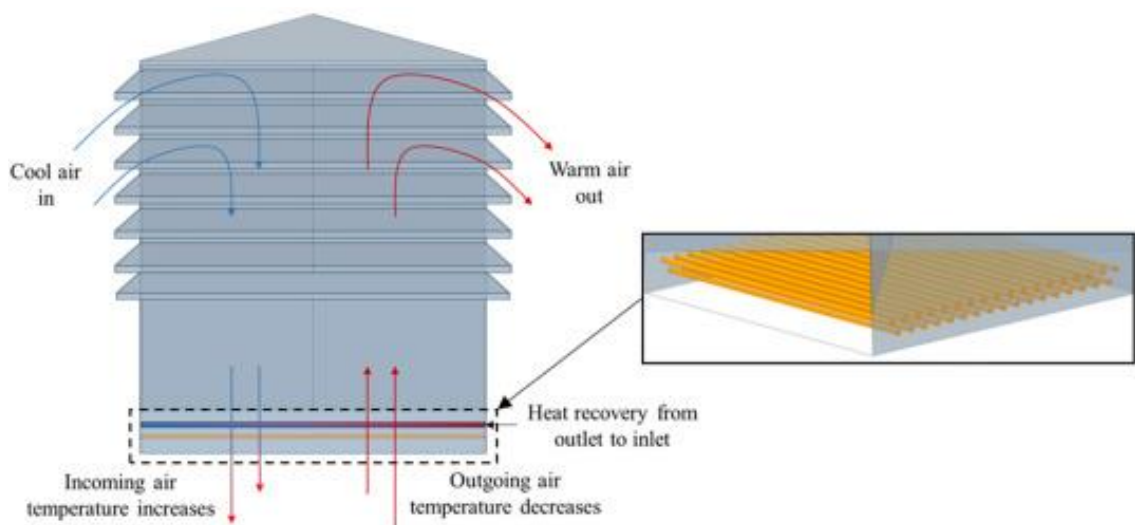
Pre-heating of air through heat pipes inside a wind tower [37]
